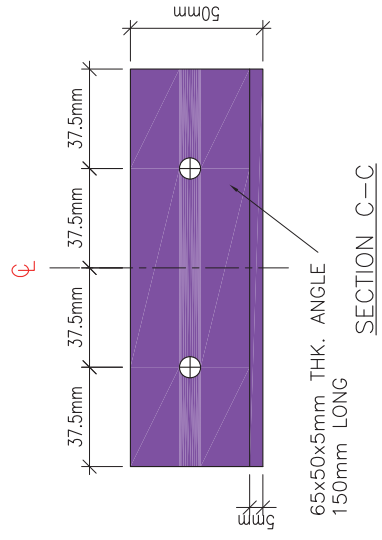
RESTRAINT AGAINST VERTICAL MOVEMENT
